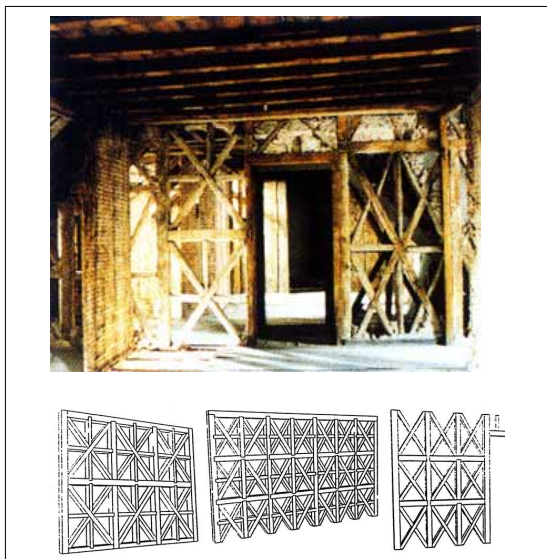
Timber elements of ‘gaiola’ enclosed in masonry interior walls (Cardoso [4])
